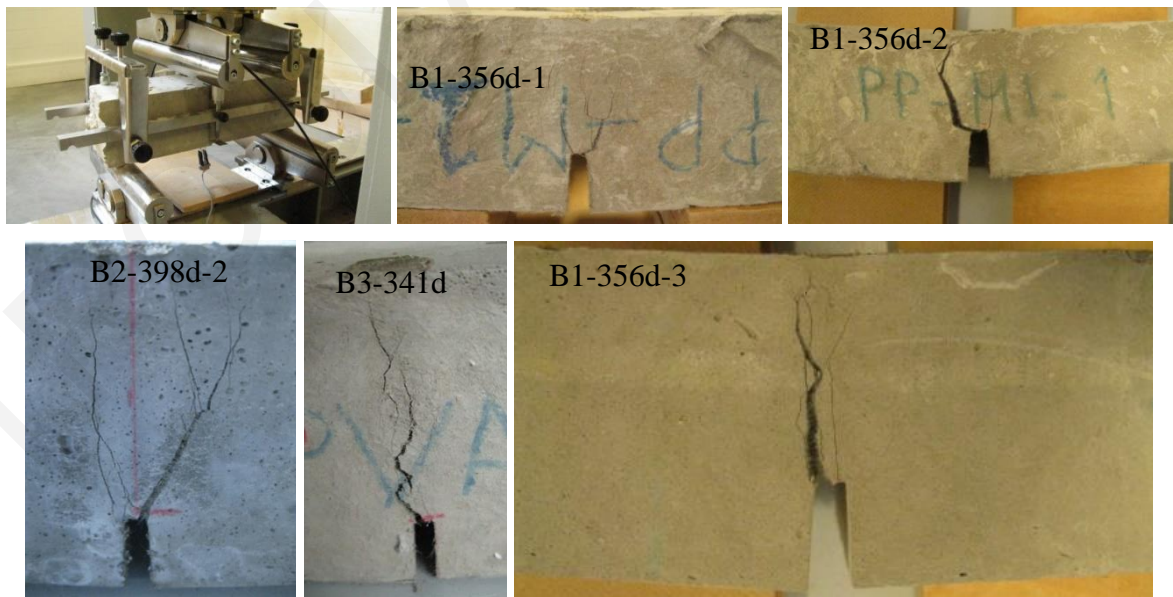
Loading setup and failure cracks of four point bending beams with a notch--testing of various mixes
